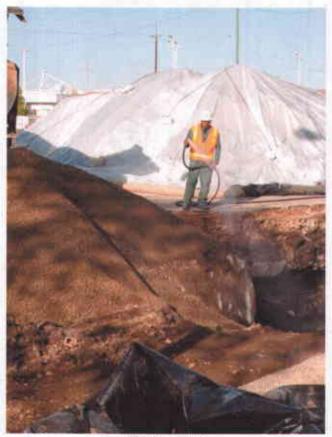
Backfilling operations: the second load of backfill material being emptied into the excavation at the location of concrete foundation (Note the water being sprayed to impart moisture for compaction; 4/26/2007)
